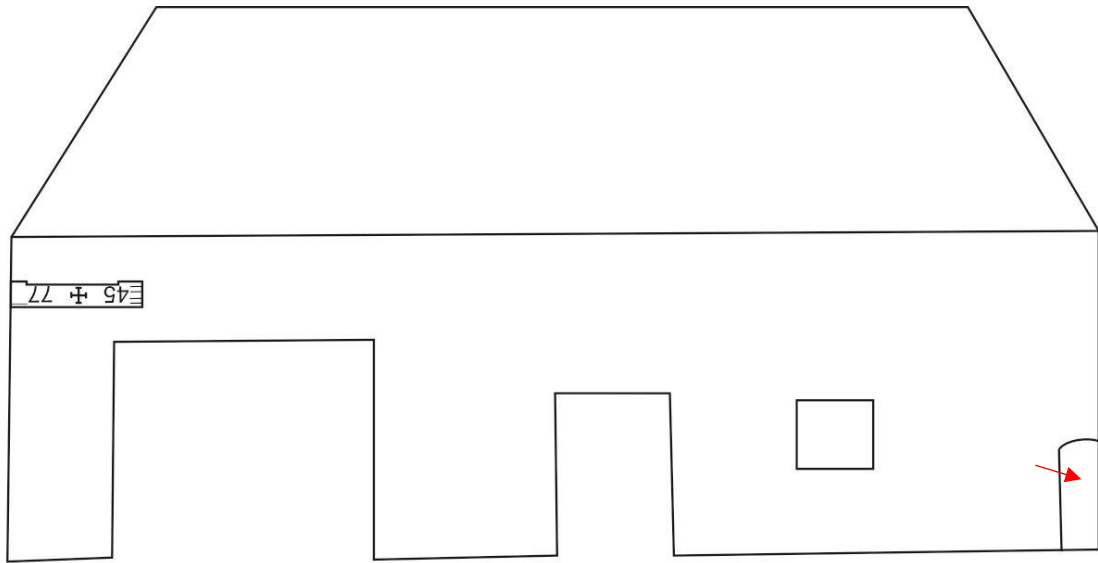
Drawn South Western facing external elevation of Building B showing location of reused architectural fragment (see Illus 21).
